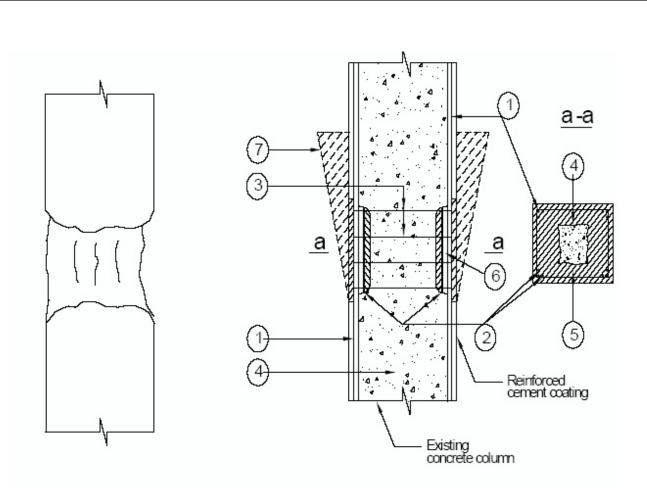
Repair of concrete columns with slight damage (1. Existing reinforcement; 2. Added new reinforcement; 3. Added new ties; 4. Existing concrete; 5. New concrete; 6. Welding; 7. Temporary castform)
